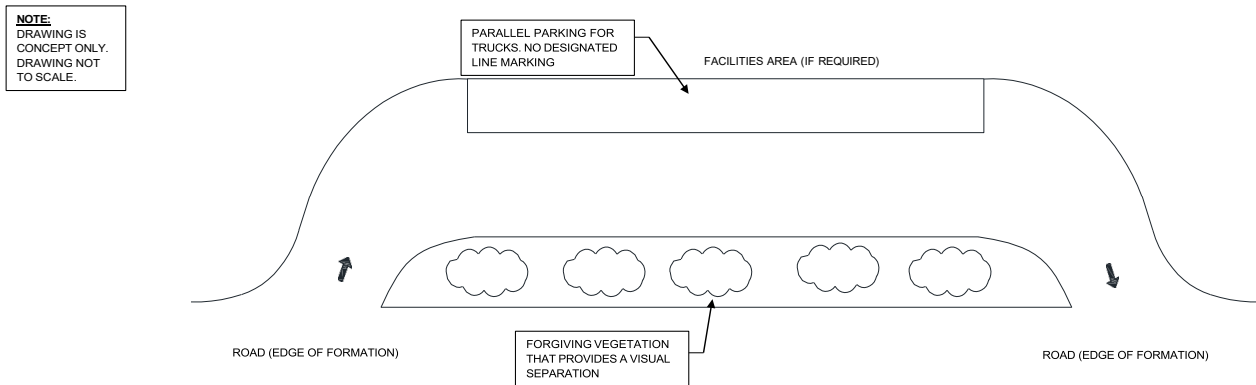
(b) – Example of preferred rest area layout – Option B
